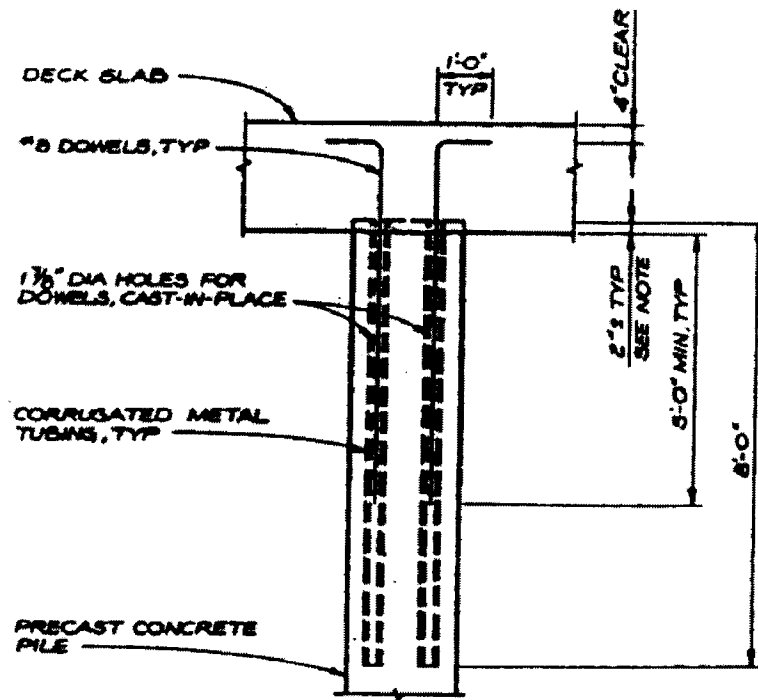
Typical Connection Detail from Port of Los Angeles Wharf, Berths 226-229
